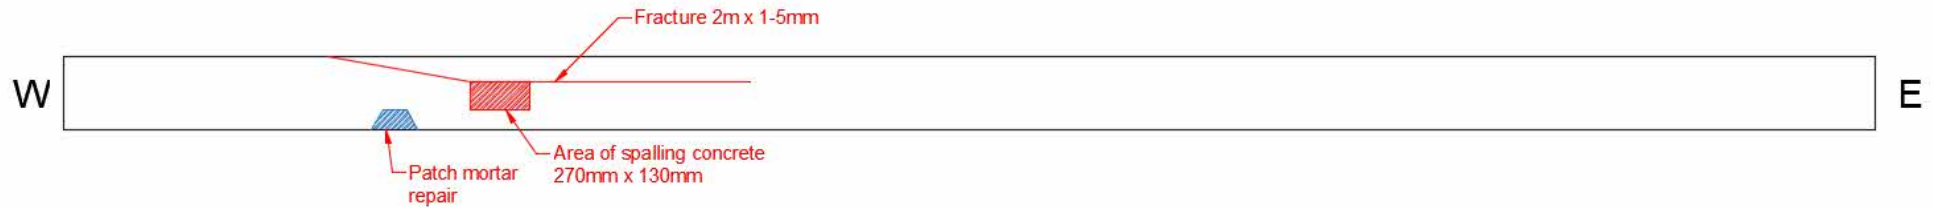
Plan View of Beam No.5 Defects (Photograph 11)
